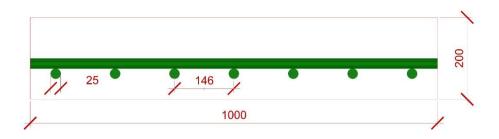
Cross section of 1m width of a deck plate. Units in mm.
